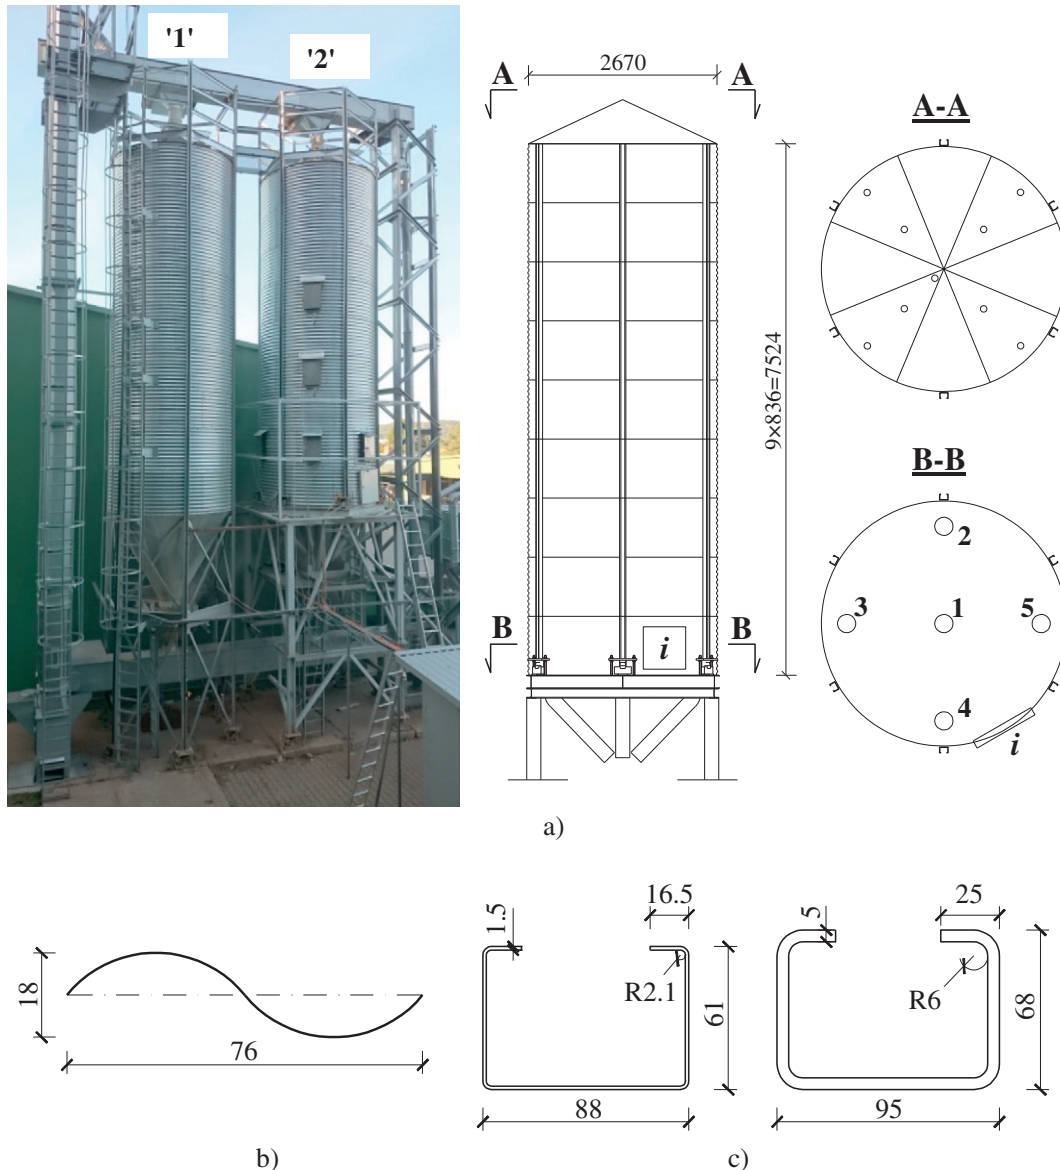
Experimental set-up: a) measuring silo '2' ('1'-'5' - outlets, *i* - inspection opening door) and storage silo '1', b) wall corrugation and c) column profiles (units are in [mm]).
